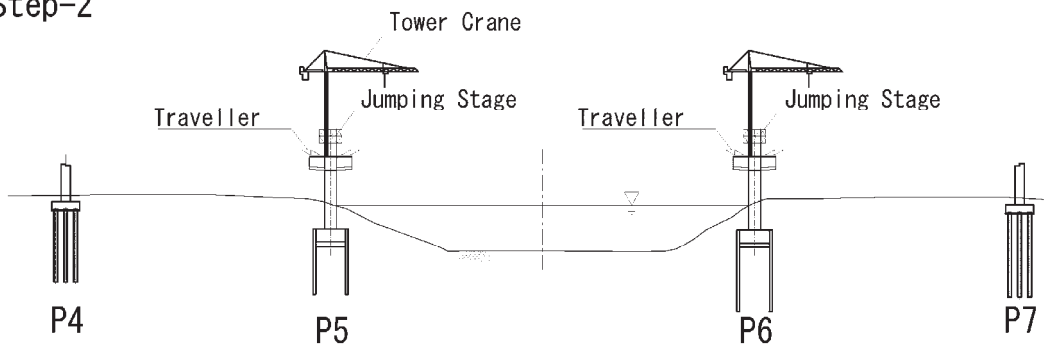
gives an example of the erection steps for Gyaing Kawkareik Bridge.
